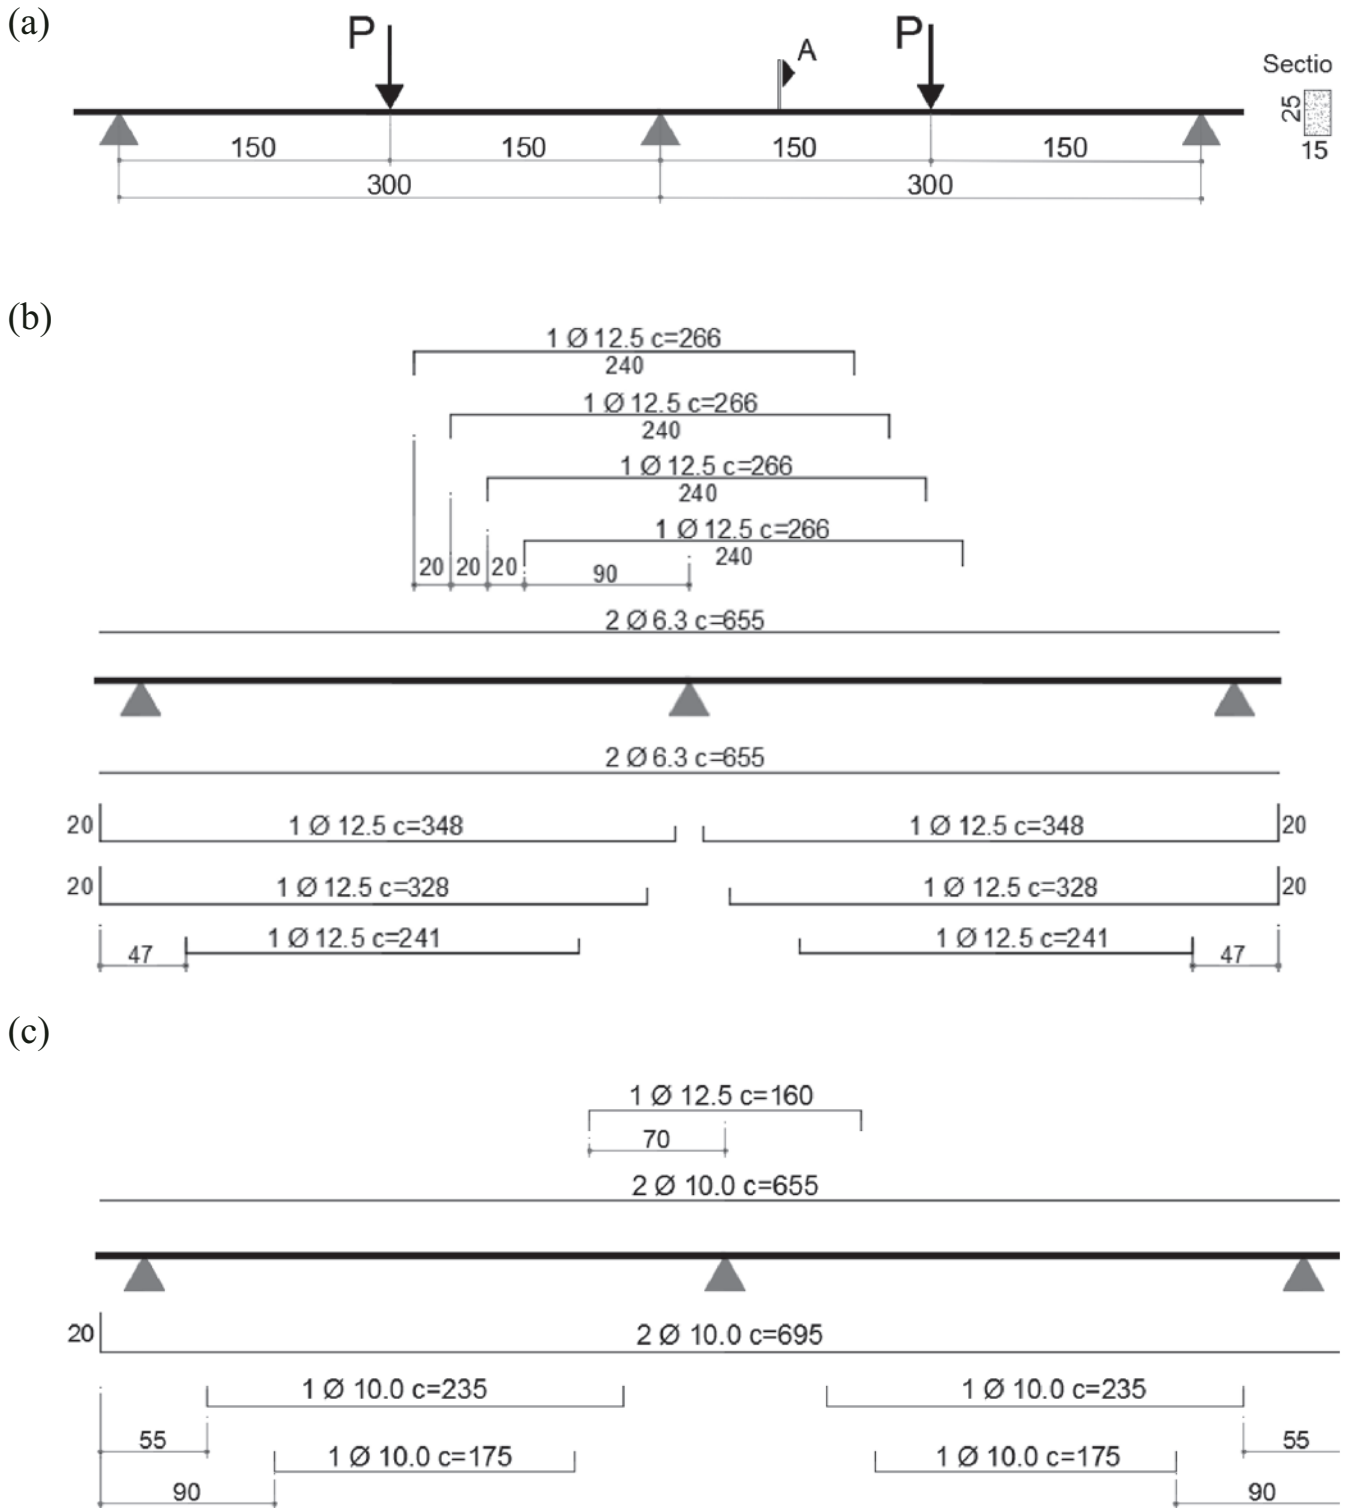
Beams tested by Silva (15): a) geometry and loading pattern; b) longitudinal reinforcement detailing for beam V1; c) longitudinal reinforcement detailing for beam V3 (dimensions in cm)
